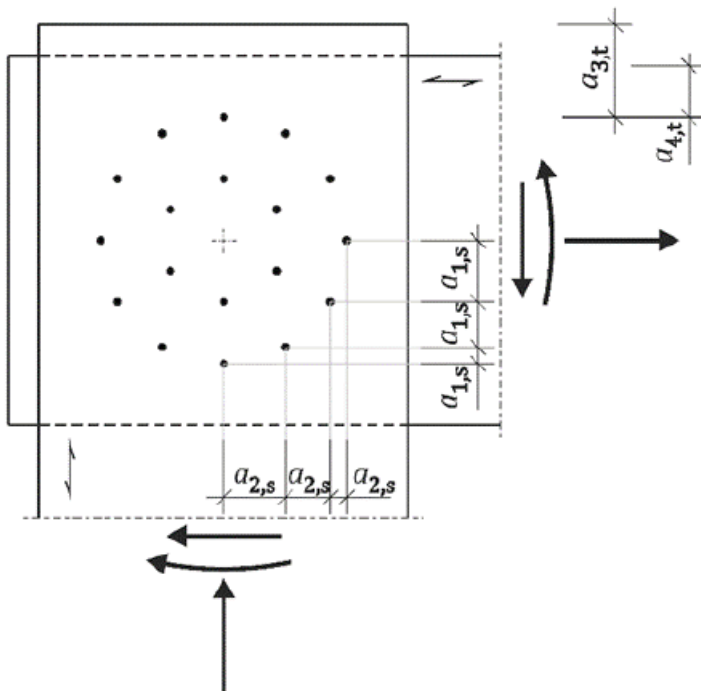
Example of staggered fasteners in a moment connection without necessary reinforcements [1].
